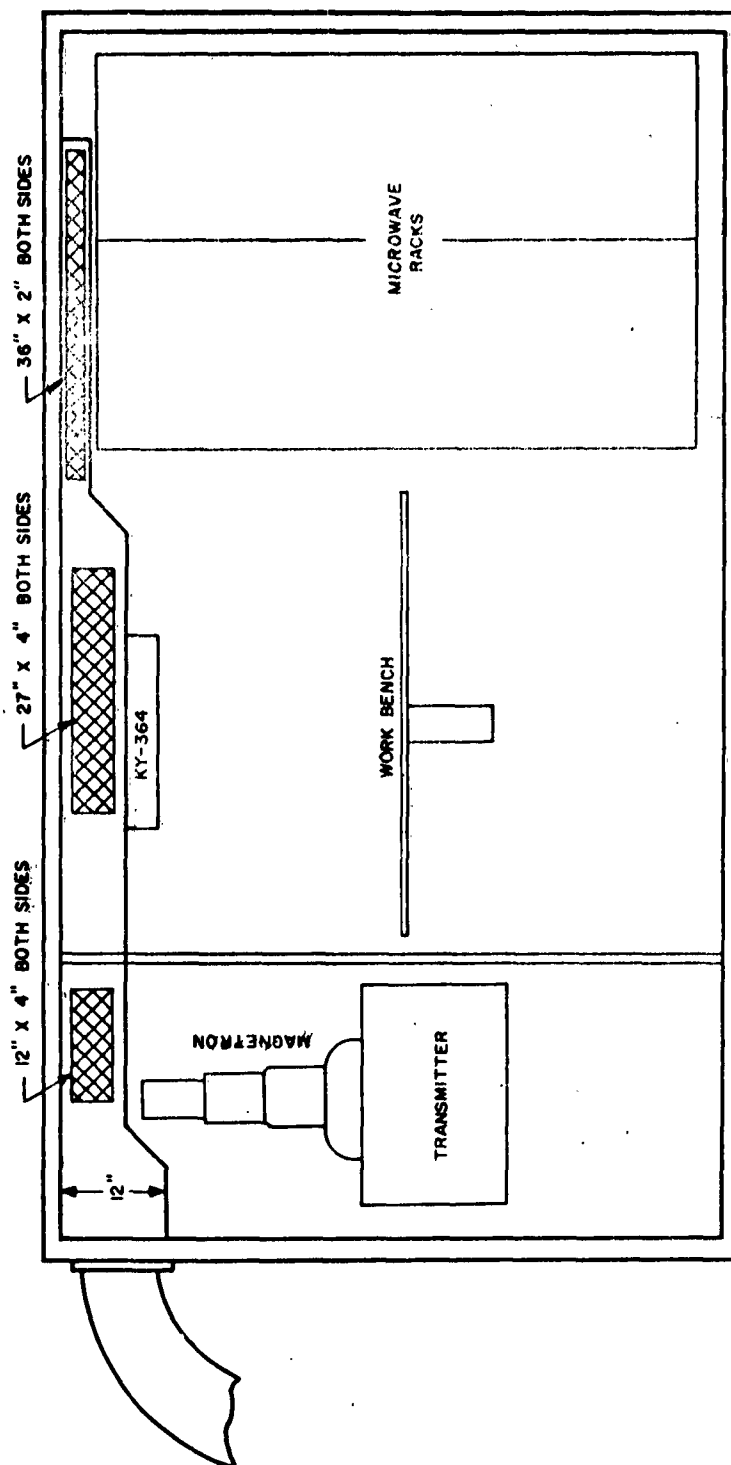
Section A-A of Air Conditioning Direct Layout
